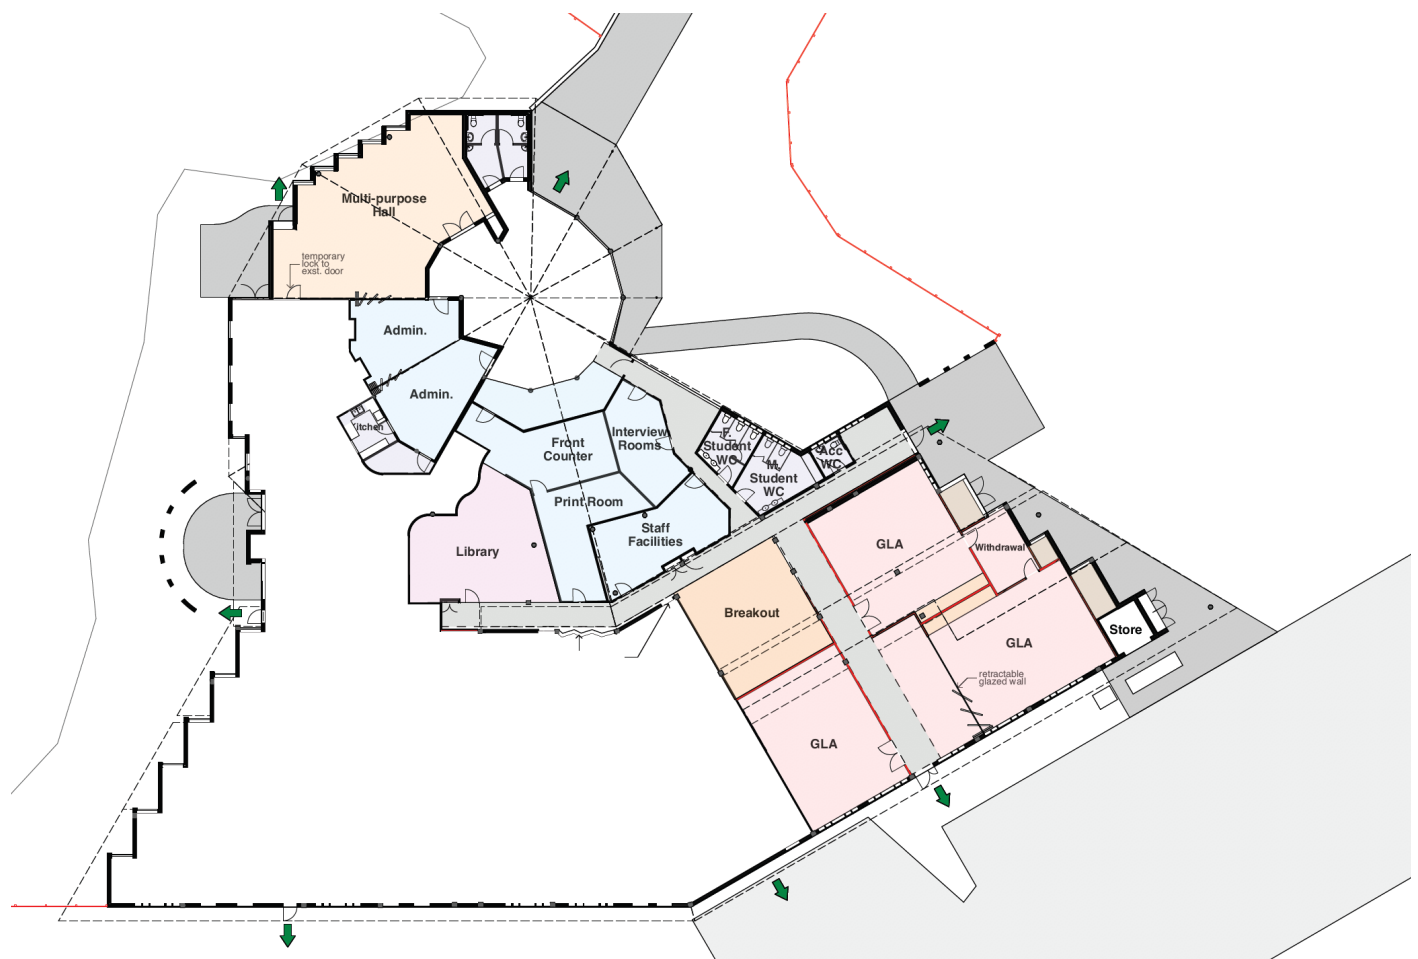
Richard Gill School Proposed Floor Plan. Source: Stanton Dahl Architects
